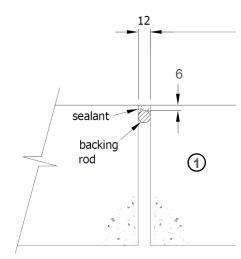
Floor linear gap system A – Assessment 1 (As shown in WF 187564 and WF 372207) - dimensions in mm
